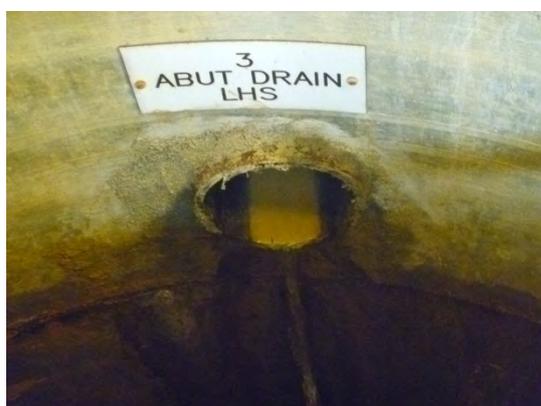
Seepage Emerging from L.H.S. Abutment Drain
